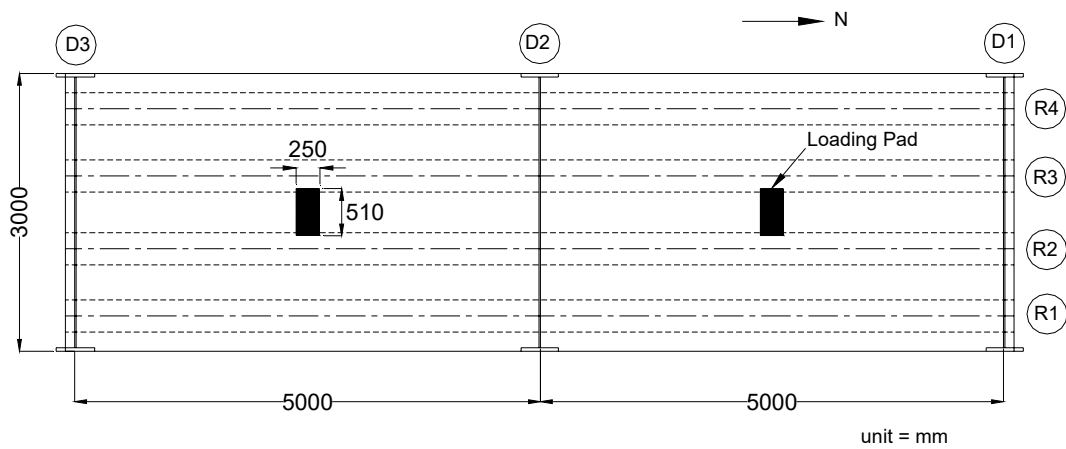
Specimens 2 to 6: Plan View with Rib and Diaphragm Designations
